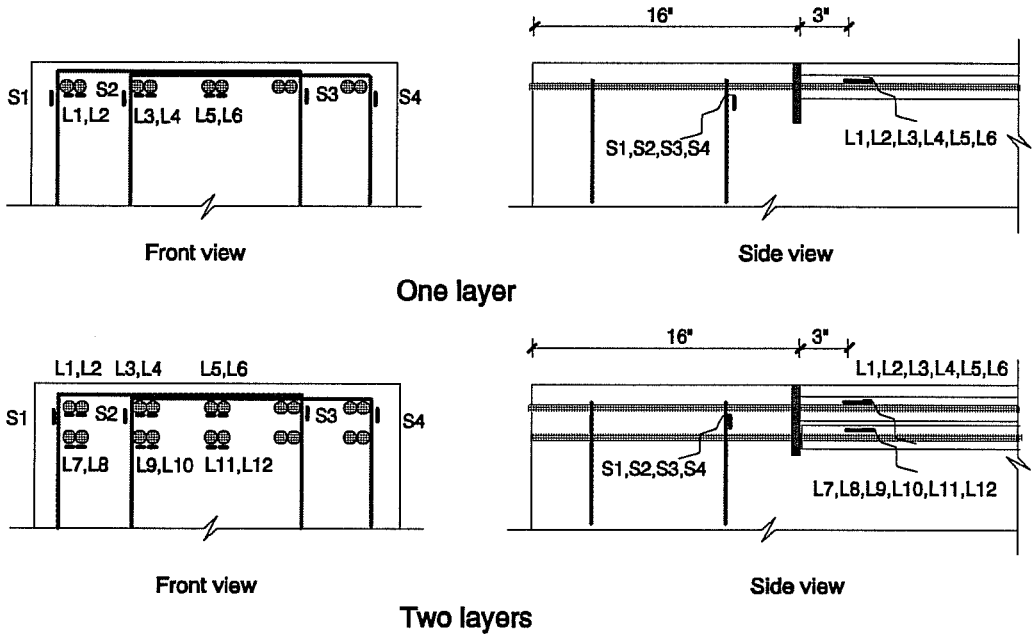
Position of strain gages for test with transverse reinforcement (Specimen #2,#3)
